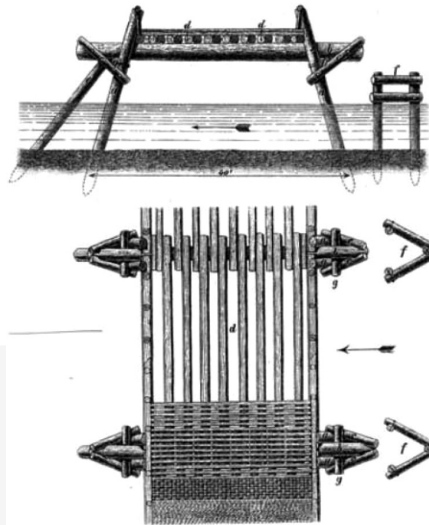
A cross-section and an aerial view of Caesar's Bridge (reconstruction according to [2])
